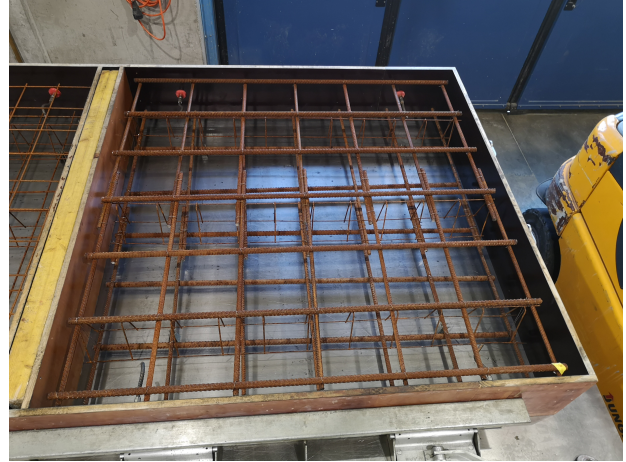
Test specimen 1 rebar rods before the concrete pour.
